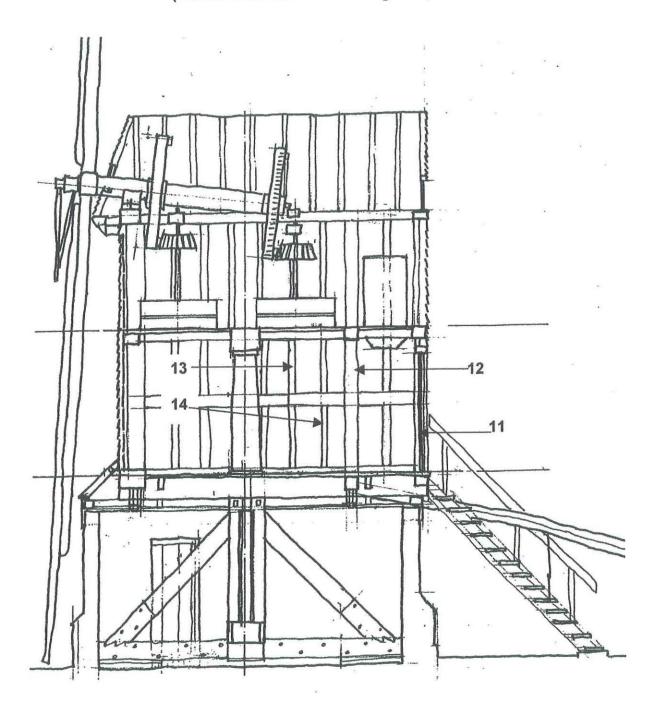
Cross-section to show timbers sampled (viewed from the west looking easr)
